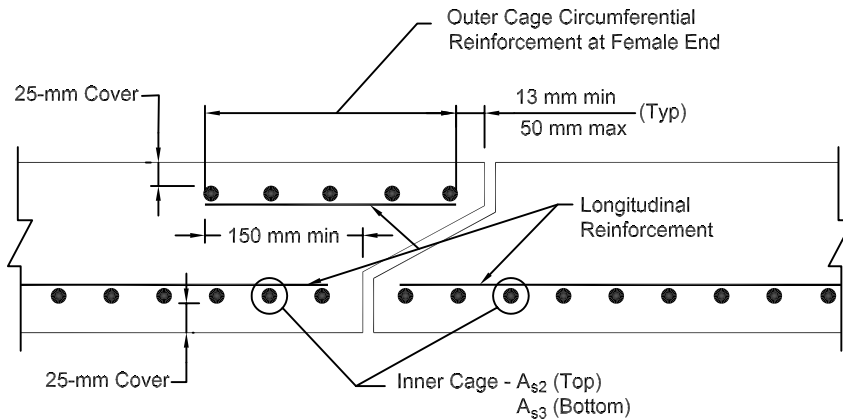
Section A-A Top and Bottom Slab Joint Reinforcement
